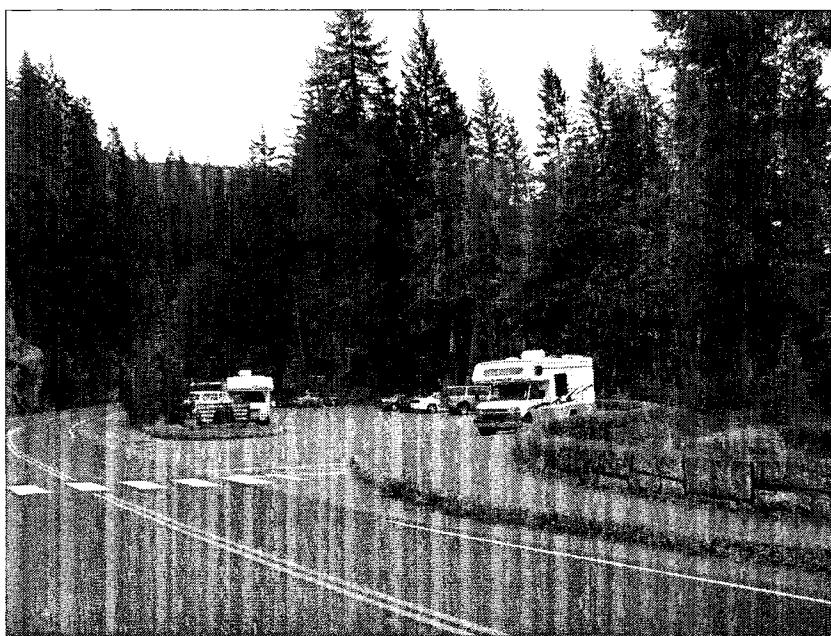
Contemporary photo showing contributing turnout at Box Canyon with sidewalk (MORA 2004).
